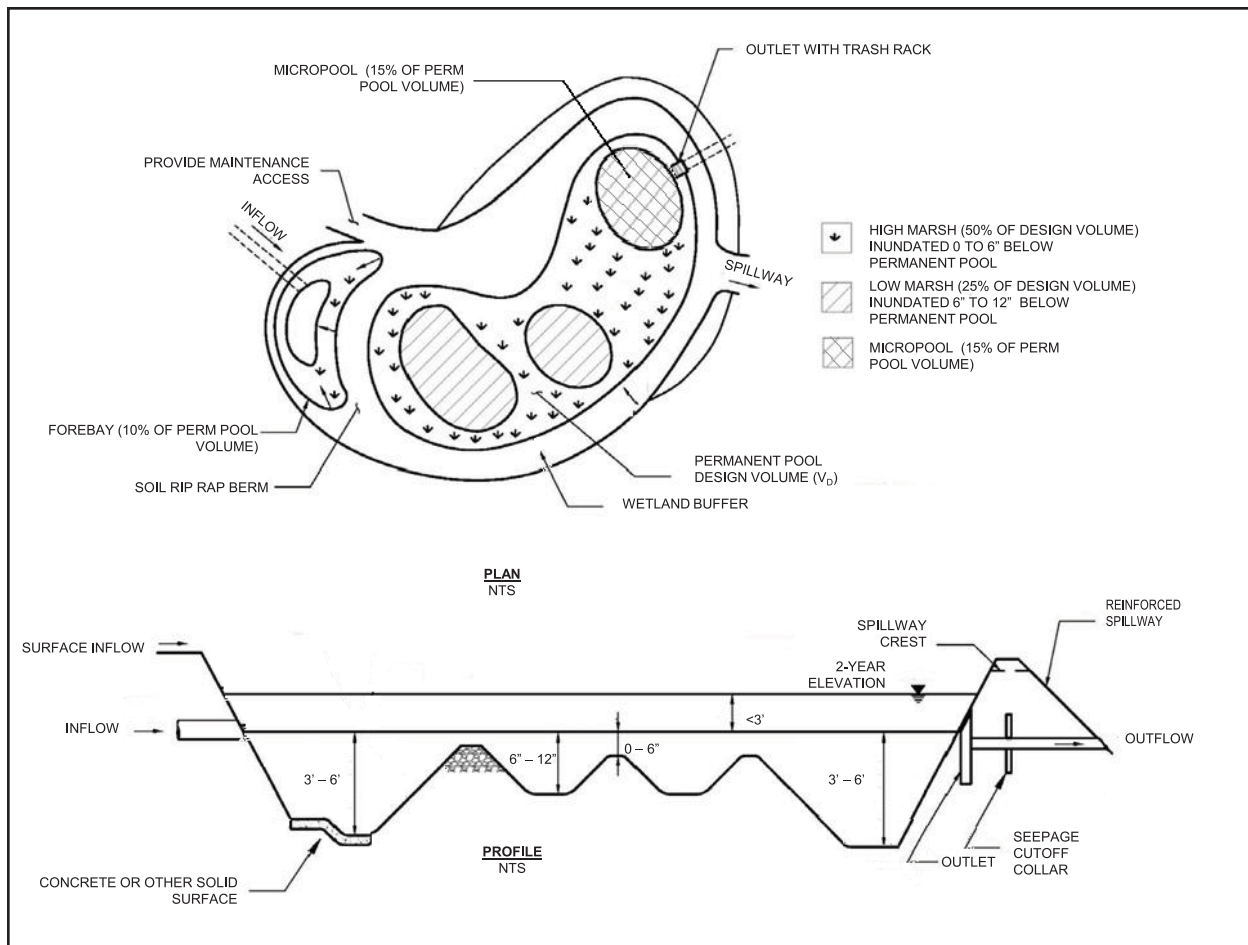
Example of a Constructed Wetland Plan and Profile View (Modified from UDFCD,2010)
